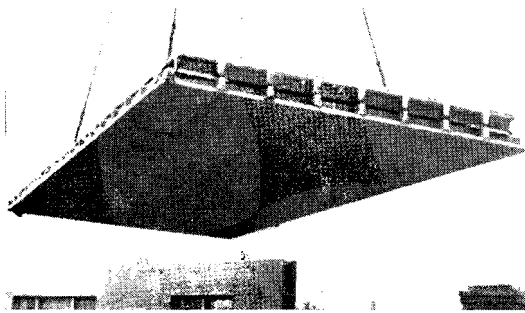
Panel of an interfloor ceiling of the "split" type (consisting of two shells).
